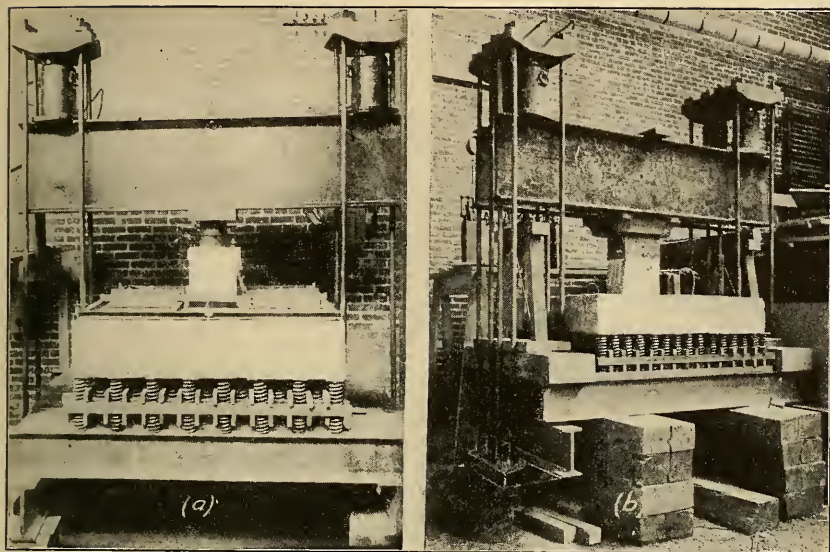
TESTING MACHINES FOR COLUMN FOOTINGS.
